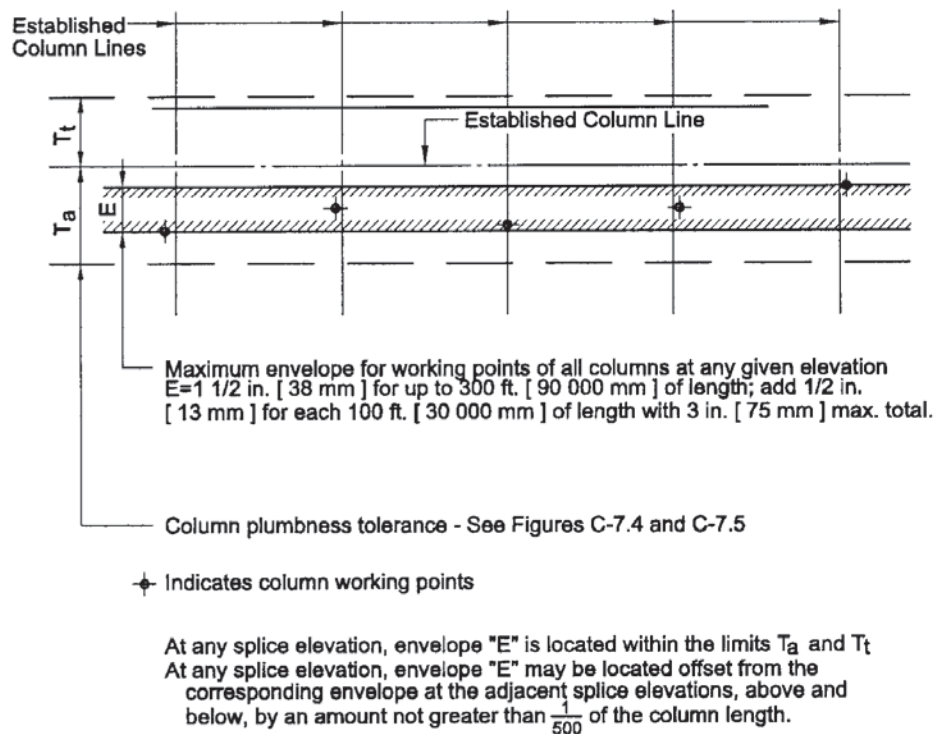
Tolerances in plan at any splice elevation of exterior columns (AISC, 2005a).
